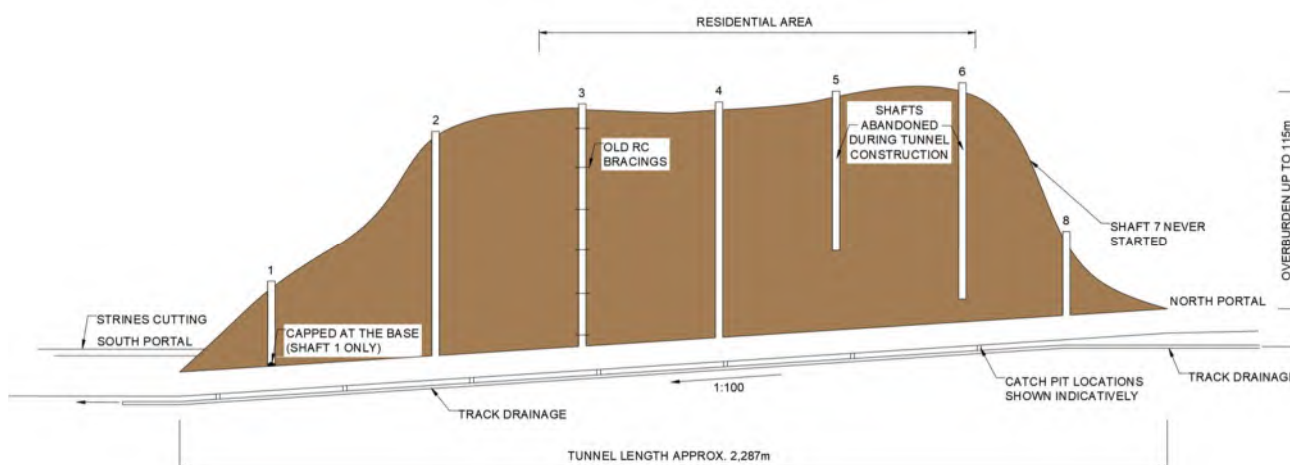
Schematic Long Section Through Tunnel (Prior to Closure)
